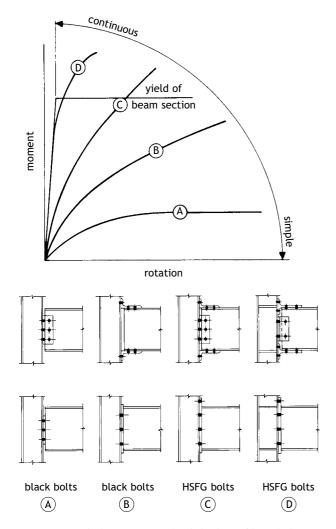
Typical moment: rotation behaviour of beam/column connections.
